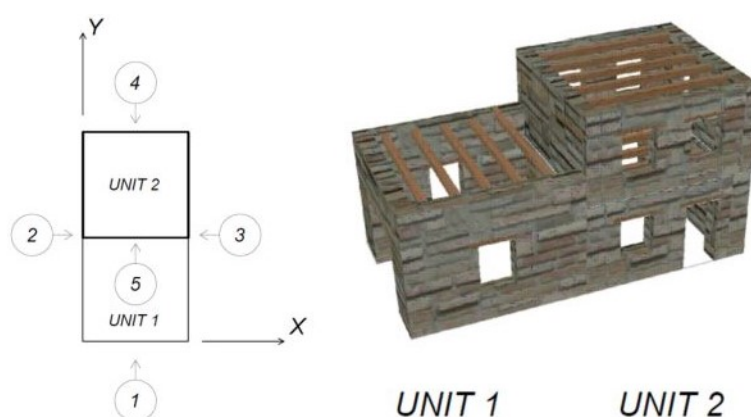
Case study of the stone masonry aggregate experimental campaign in Tomić et al. (2022a). 3D view, floor plan with beam orientation and facade layout of the two units.
